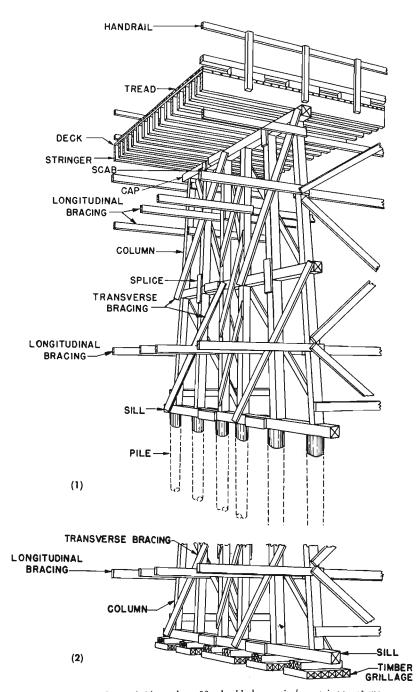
Highway bridge, class 50, double-lane, timber stringer spans, framed timber tower:
